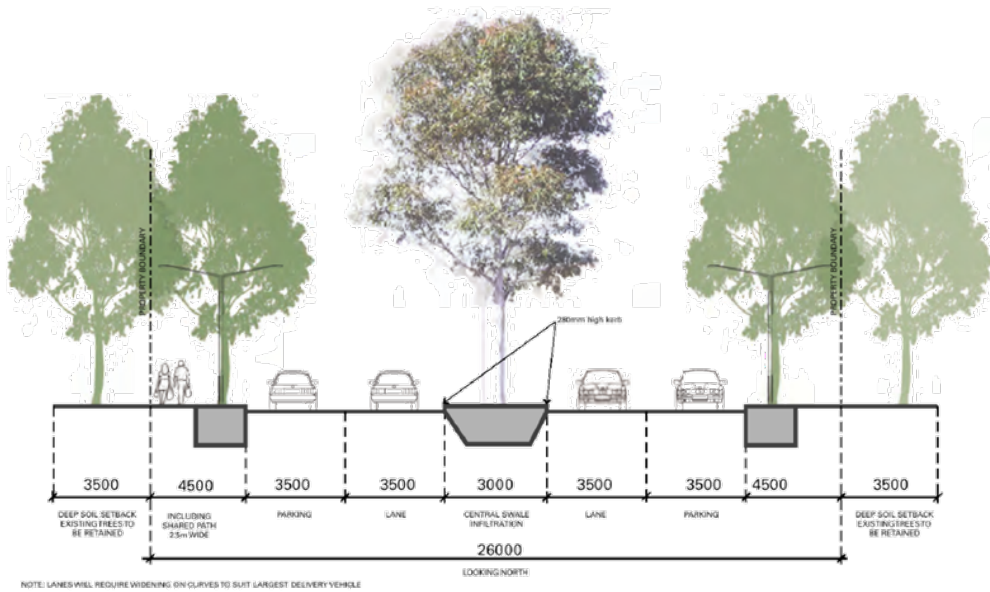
TYPE 1: TOWN CENTRE ENTRY STREET
